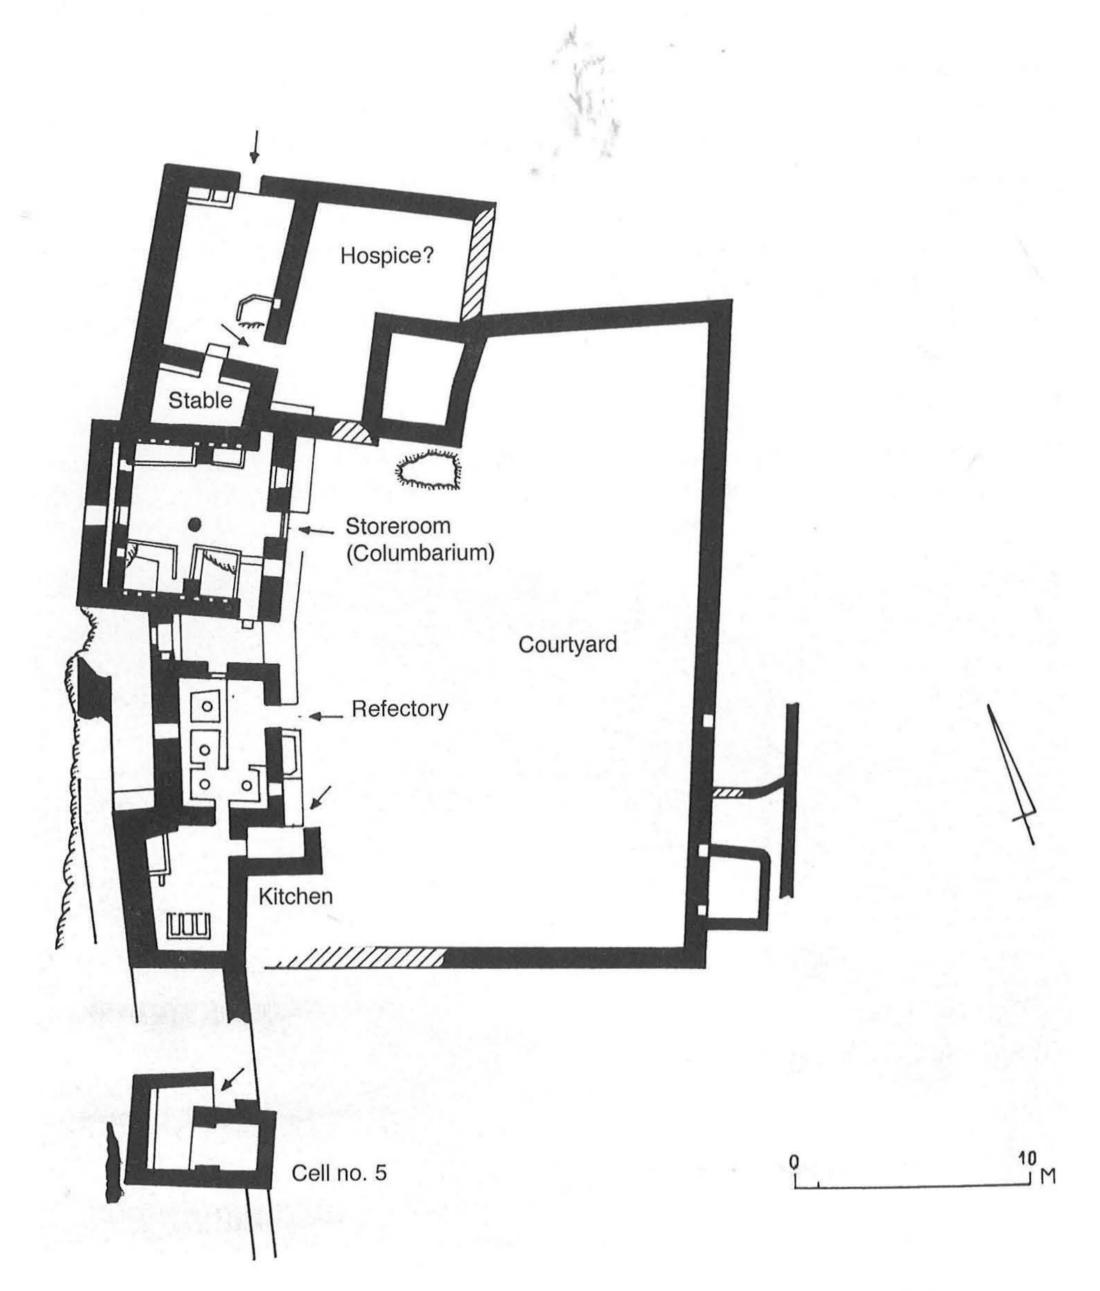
Plan of the service buildings of Masada and Cell 5 (after Masada III, Plan 38).
